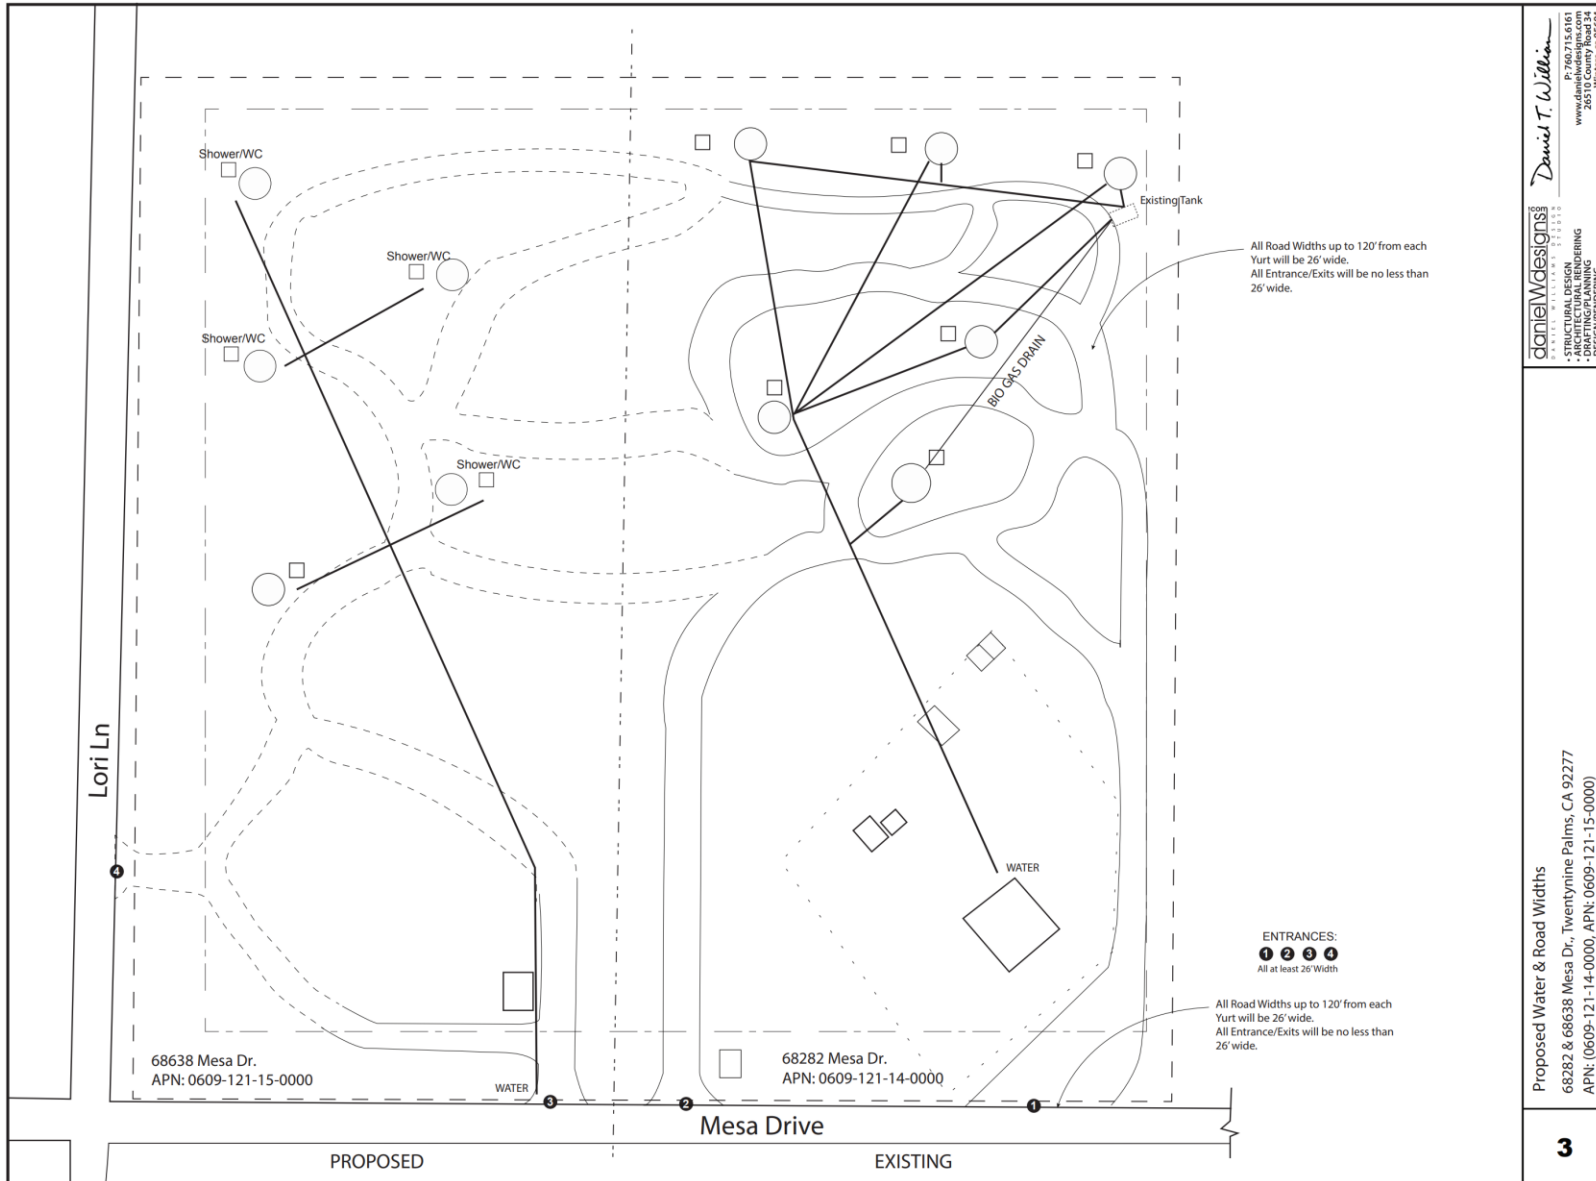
PROPOSED INTERIOR ROADS AND DRIVEWAYS
